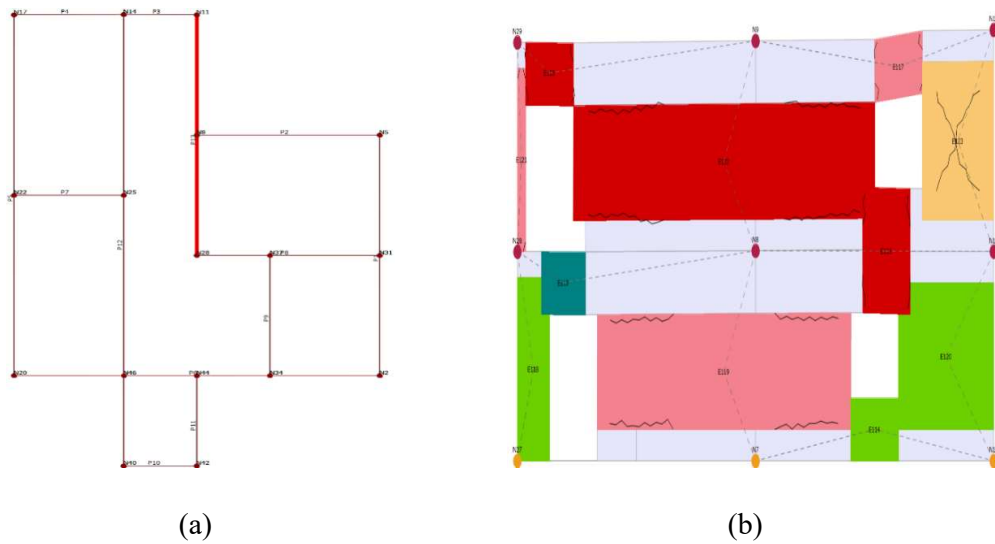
(a) Plan view of structure (b) Deformed shape of wall to check damage
